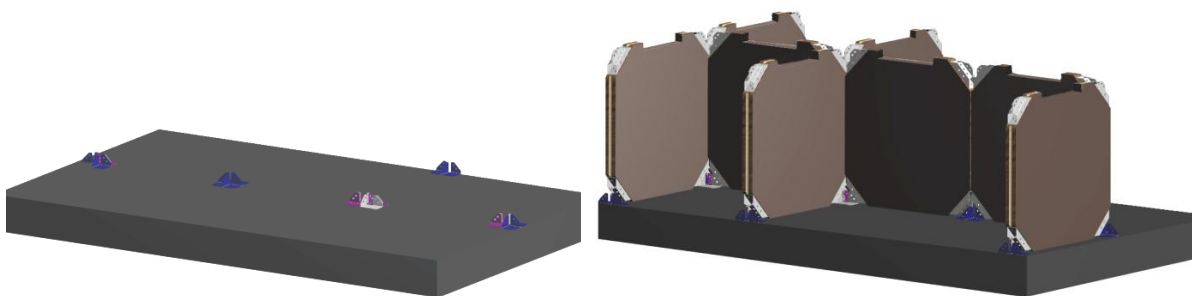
Assembling phase: foundation plates (left) and walls connected to the foundation (right), it is possible to see the slots for the floors
